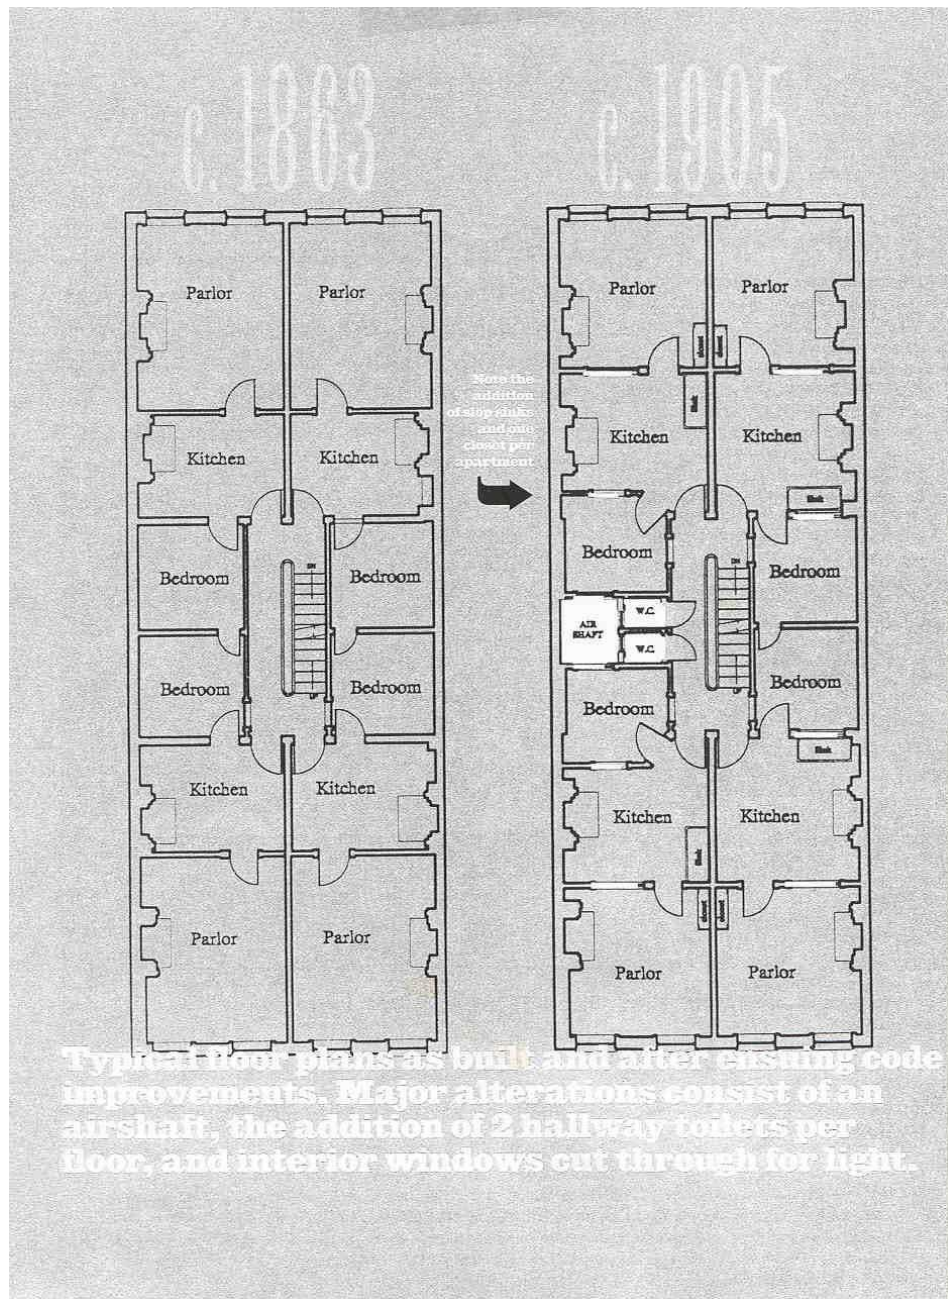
A typical tenement plan in 1863 and 1905. Caption reads, "Typical floor plans as built and after ensuing code improvements. Major alterations consist of an air shaft, the addition of 2 hallway toilets per floor, and interior windows cut through for light."
